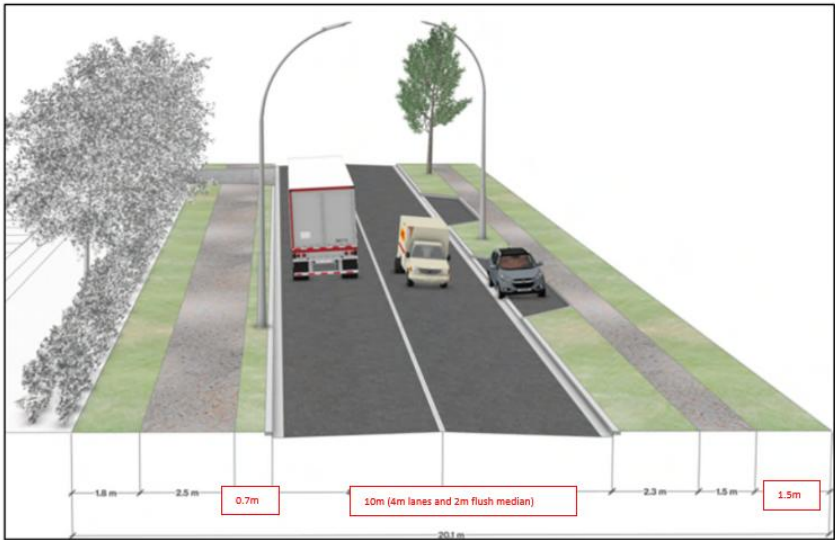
e: Indicative Old Ruffell Road upgrade cross section (Collector)
